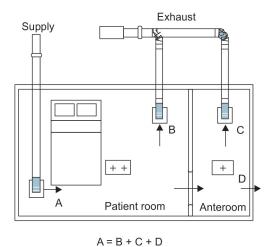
Positive pressure isolation rooms (adapted from HVAC design for healthcare facilities by CED engineering)¹²
